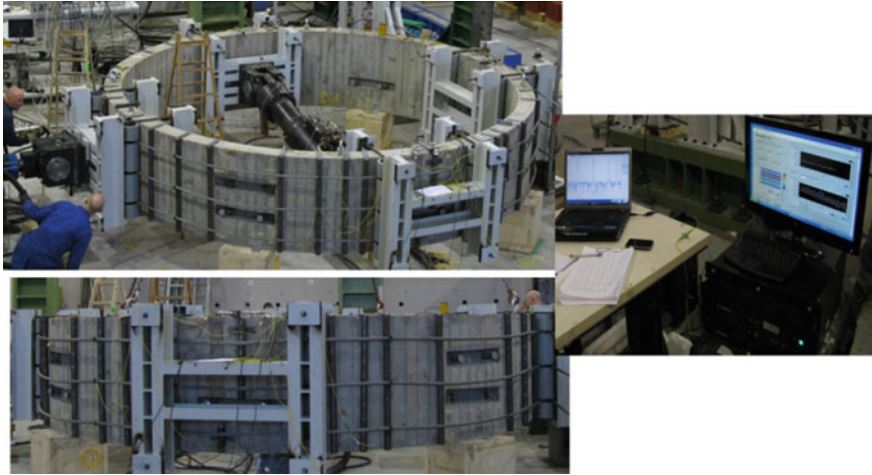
FBG and BRILLOUIN sensors installed on test tunnel ring [9]
